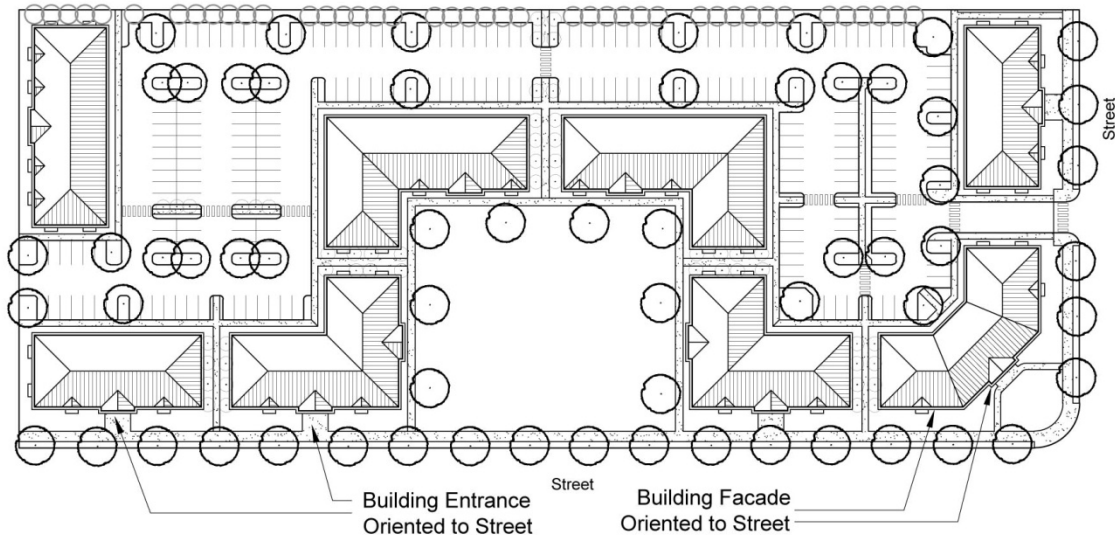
(b).4 - Site Layout - Building Orientation
